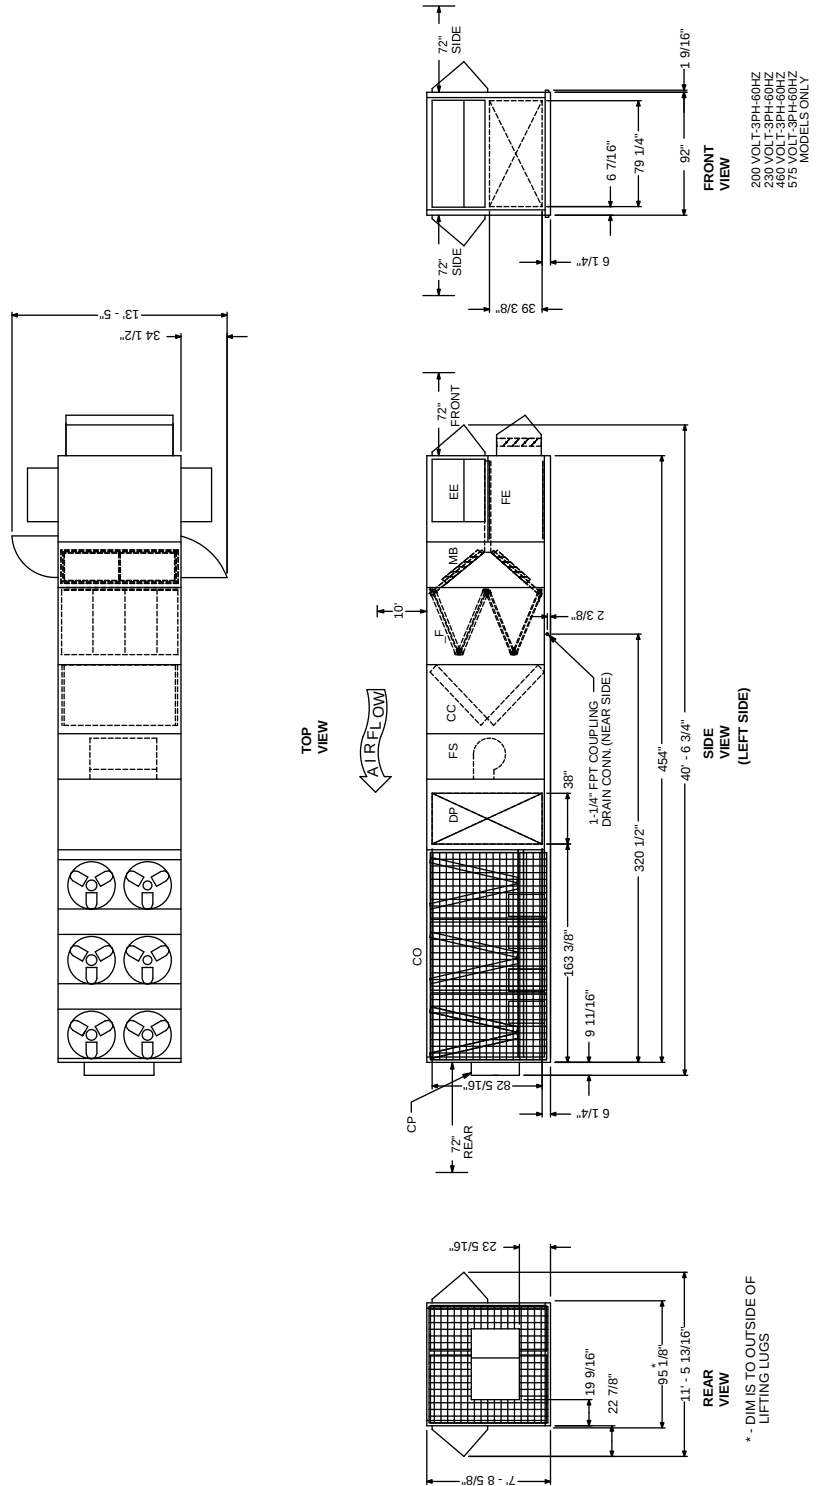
GENERAL ARRANGEMENT DRAWING
